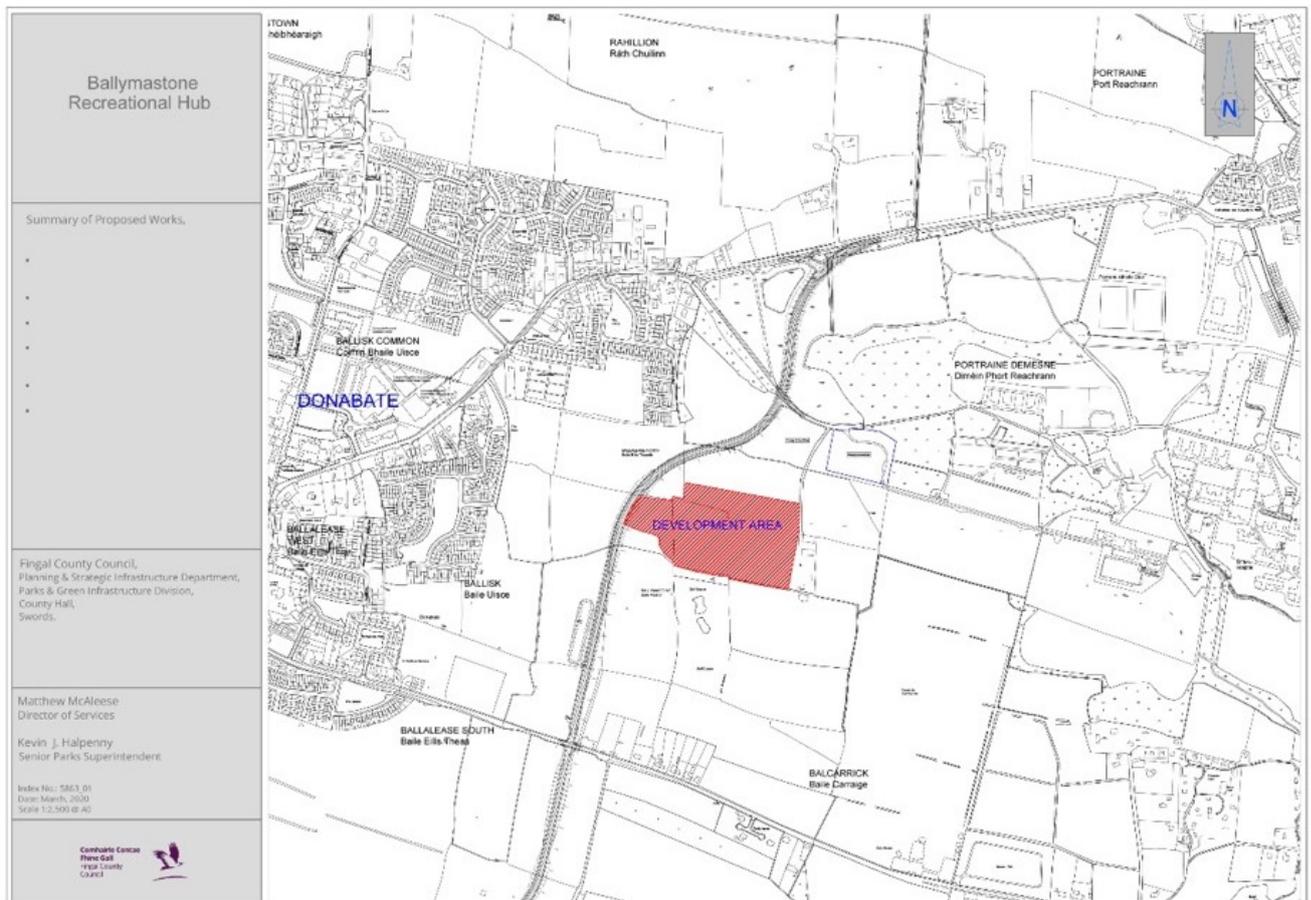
Location of proposed development site (refer to accompanying documentation for full details)
